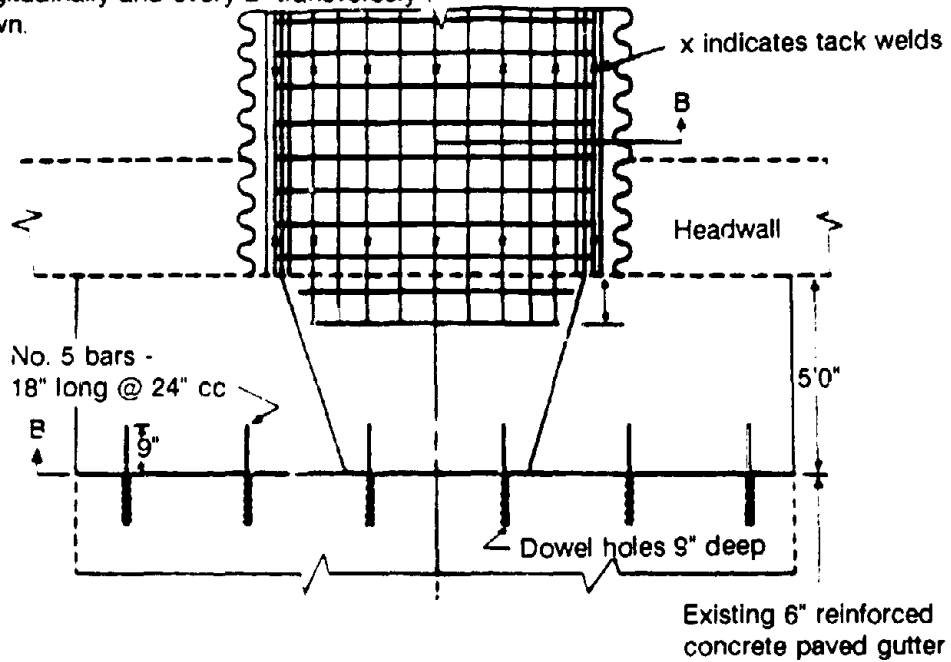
Reinforcing plan for invert paving.⁽³⁾
